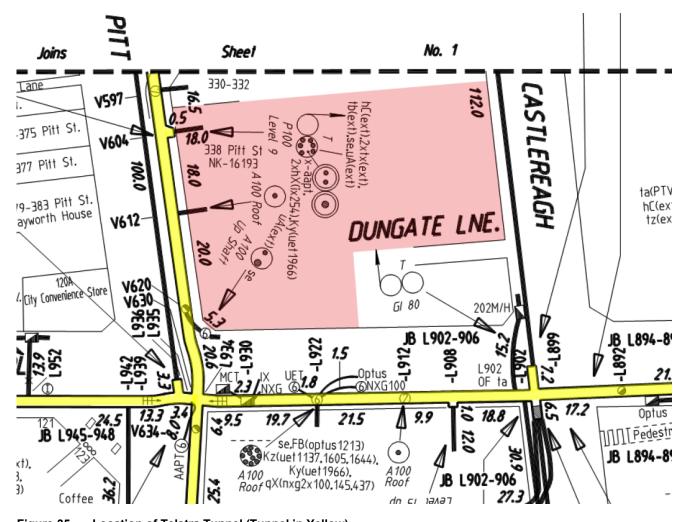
Location of Telstra Tunnel (Tunnel in Yellow)
